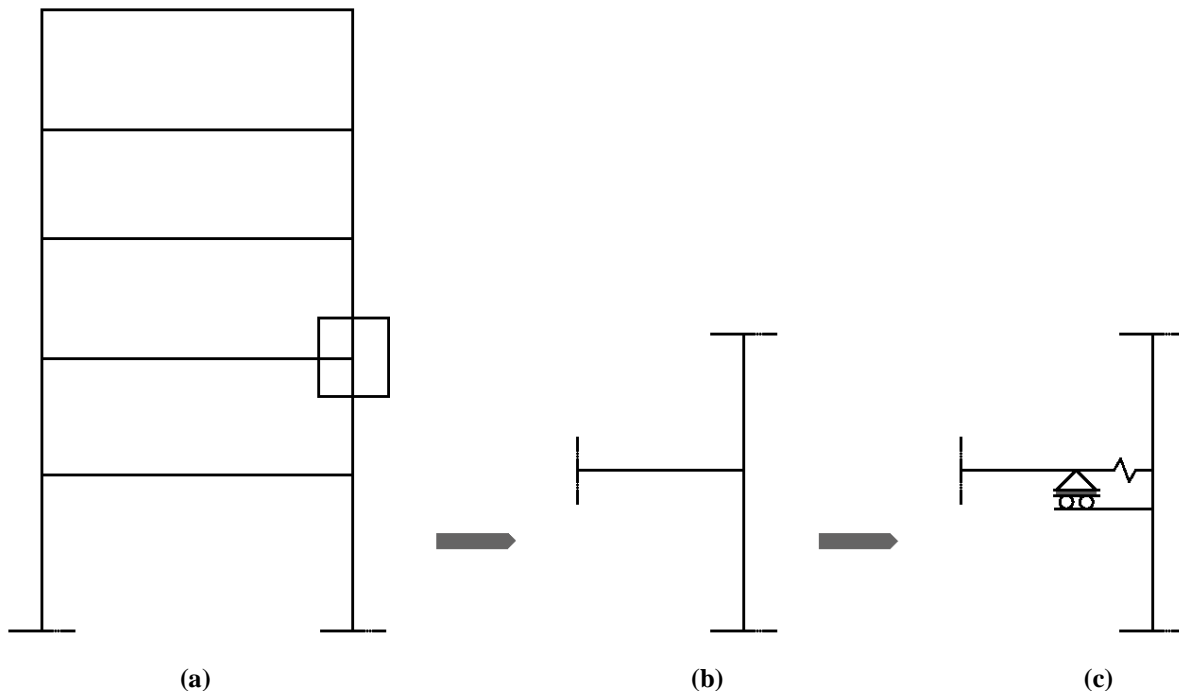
The difference between the ordinary rigid connection and the proposed connection. a) Typical 2D frame, b) Typical beam-column joint, c) The new proposed connection.
